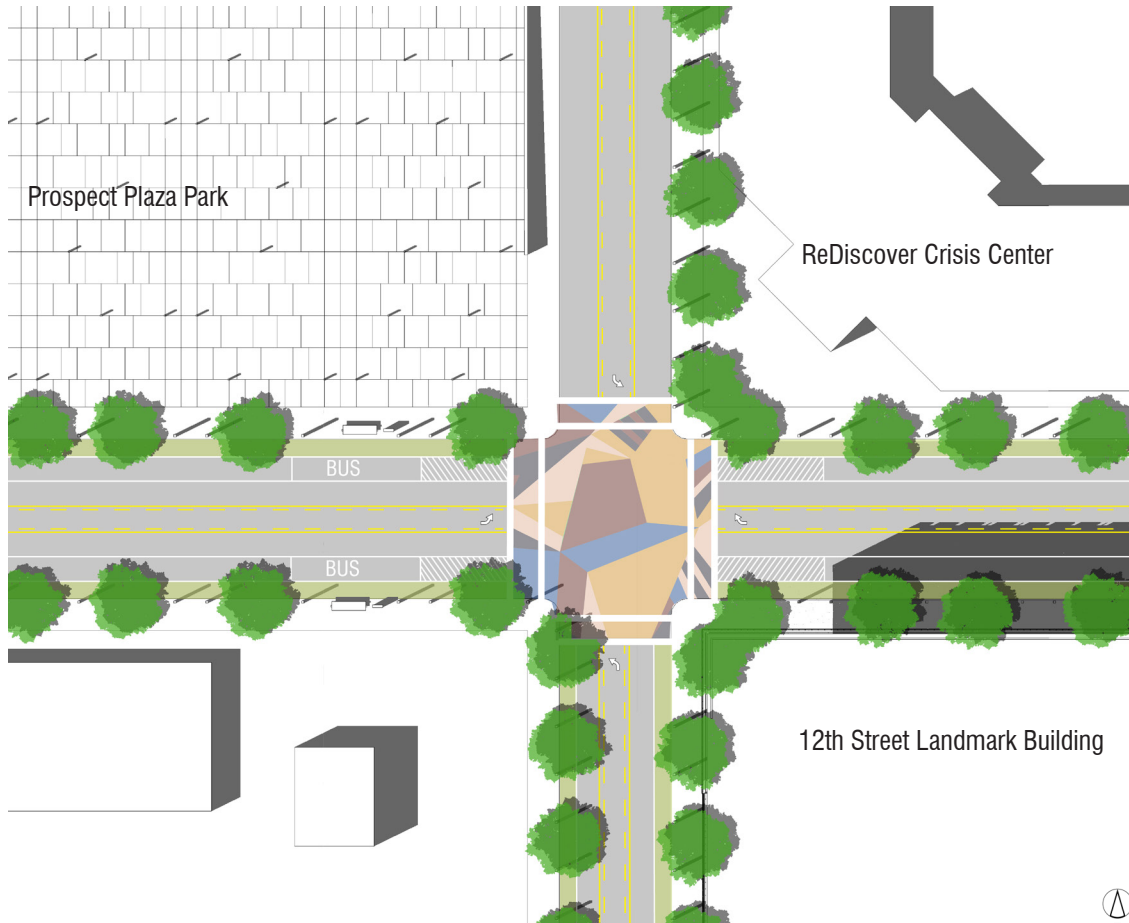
Intersection Plan - 12th and Prospect Ave.
